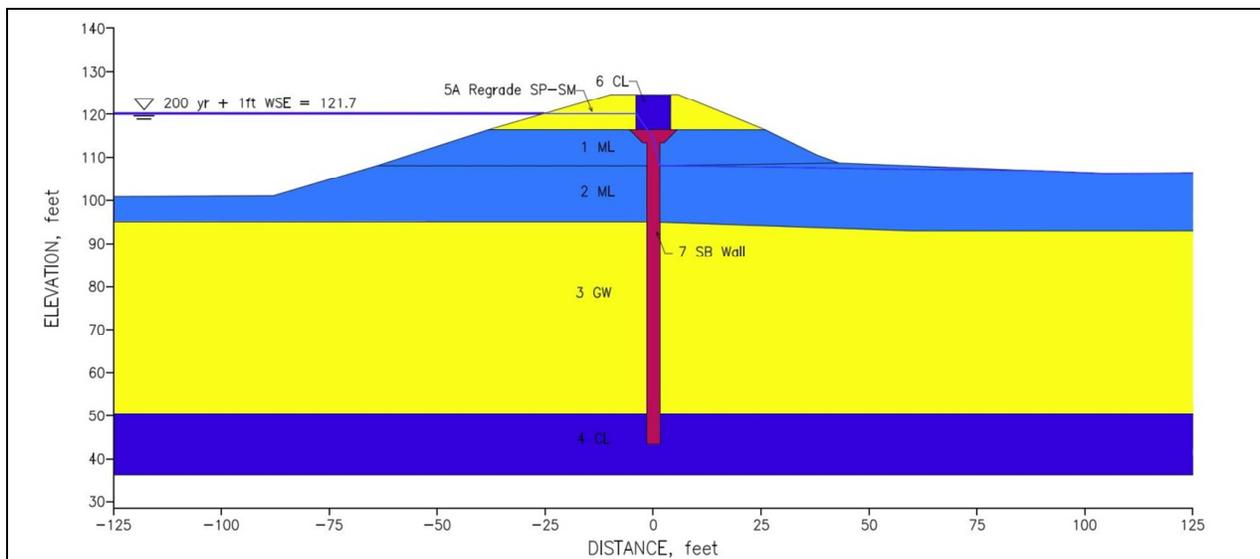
Typical Cross Section of Fully Penetrating Cutoff Wall Forming a Seepage Barrier
